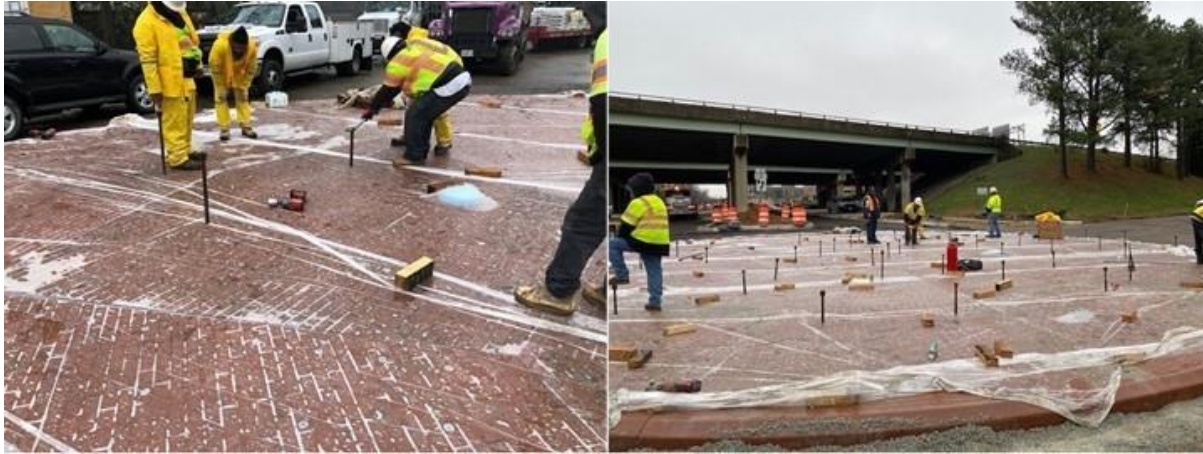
Surface Elevation Adjustment Using Leveling Bolts
